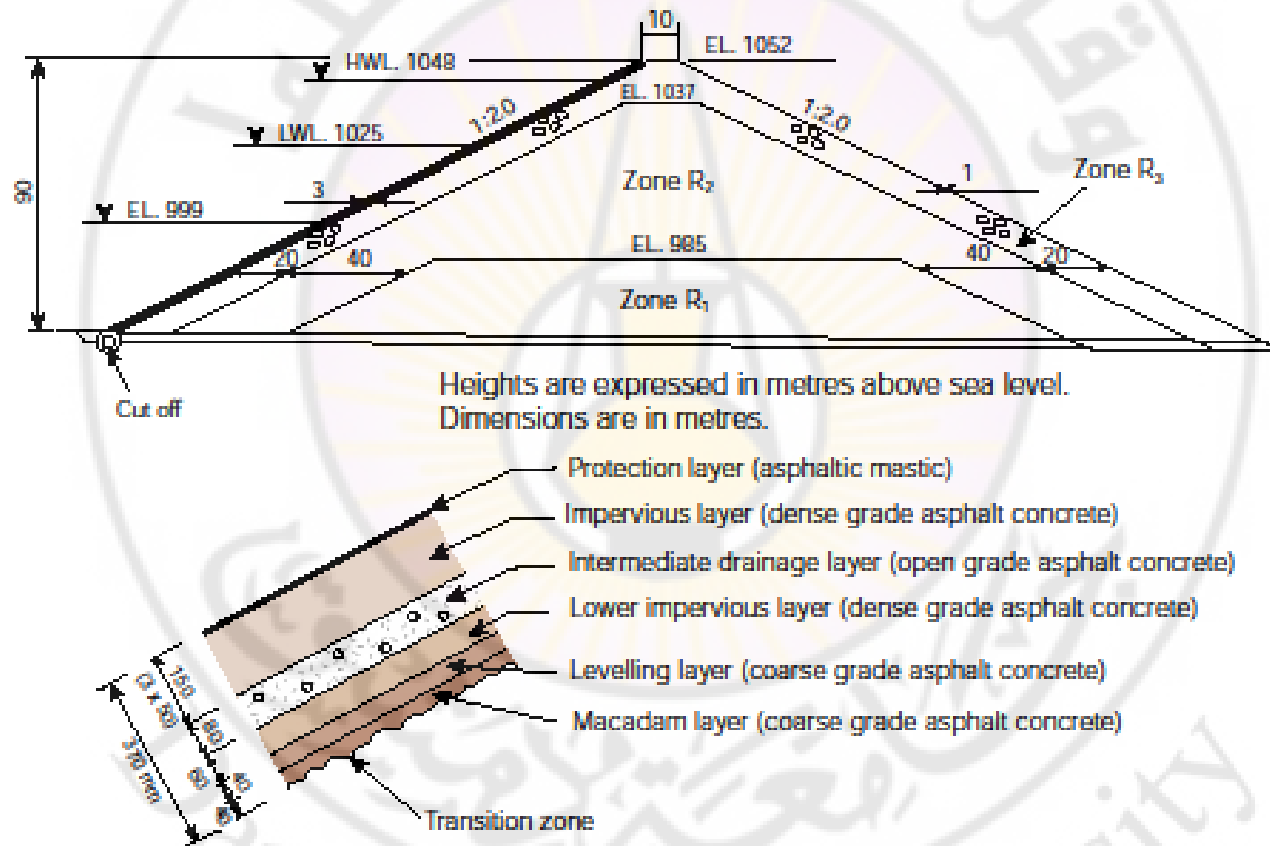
Yashio dam, Japan 1992: cross-sections of dam with inspection gallery and facing⁽⁷⁾
